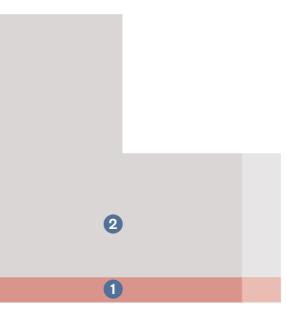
Building C (Enterprise Yard) Facade Principles - 01
